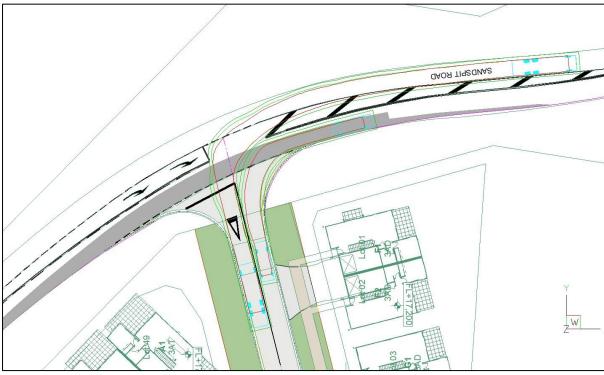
Sandspit Road Intersection - 10.3 metre Truck (Right Out) & 6.3 metre Van (Left In)
